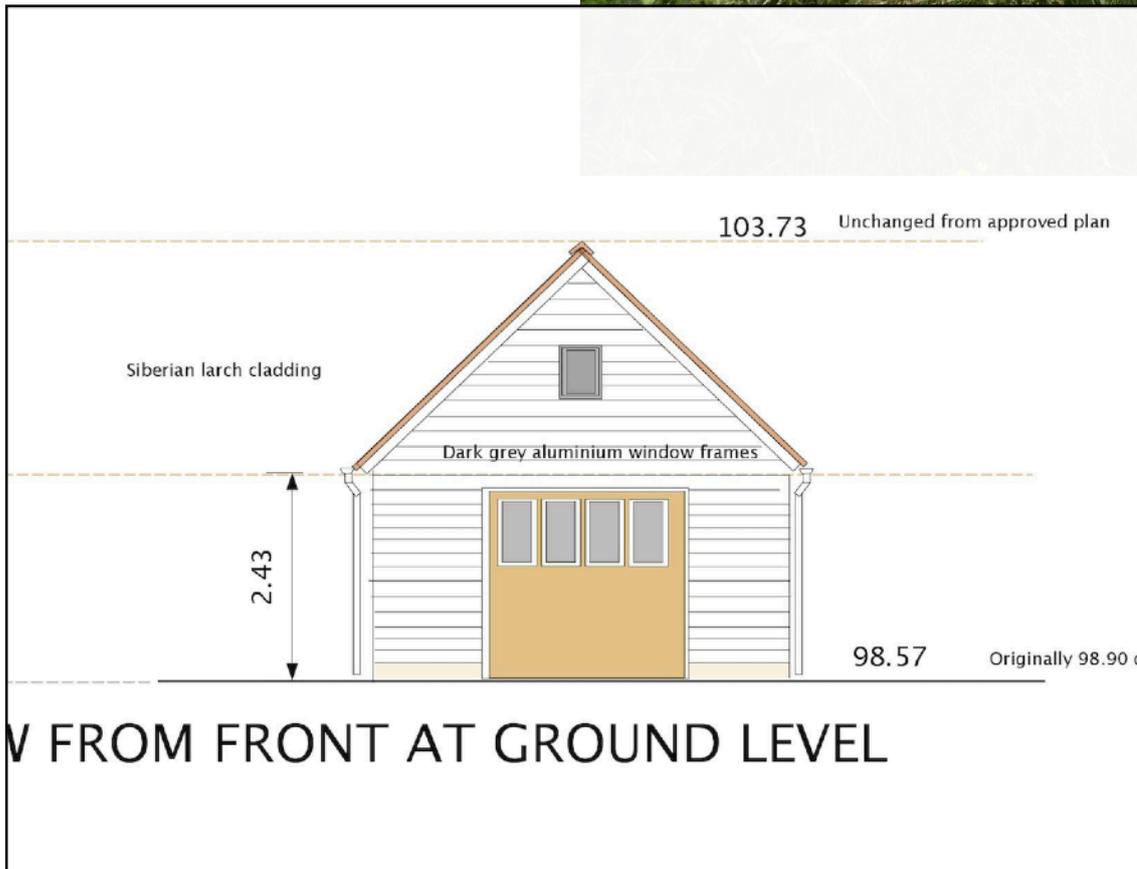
Extract from submitted plan ref 358/10G 10/07/2018
